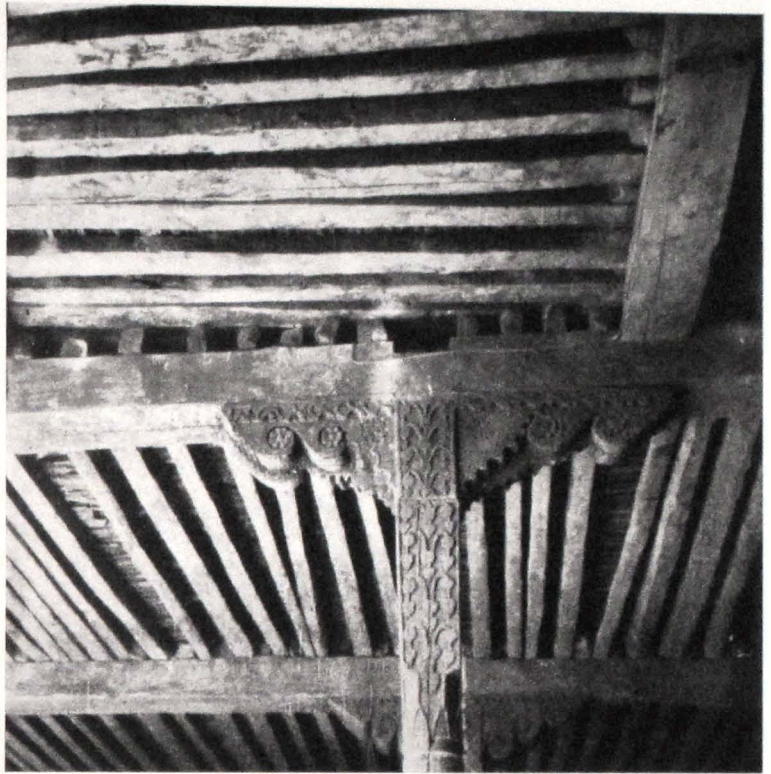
Madyan. Wooden roof and pillar in the mosque.
